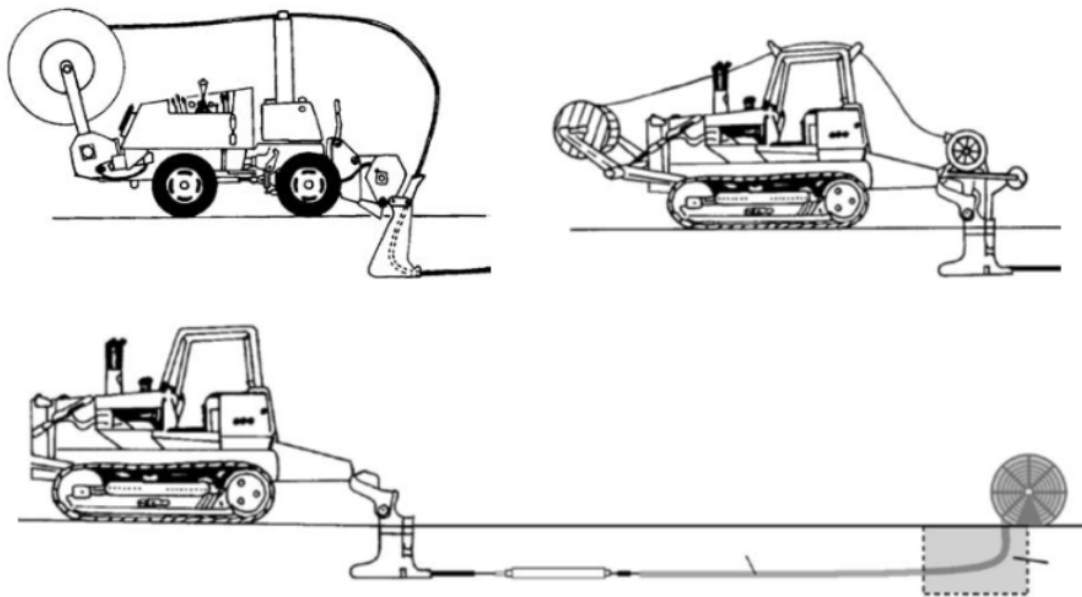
Schematic diagrams of typical trenchless equipment showing a single shank or blade cutting open a narrow slot and installing cable, conduit, or pipe in a single pass.
